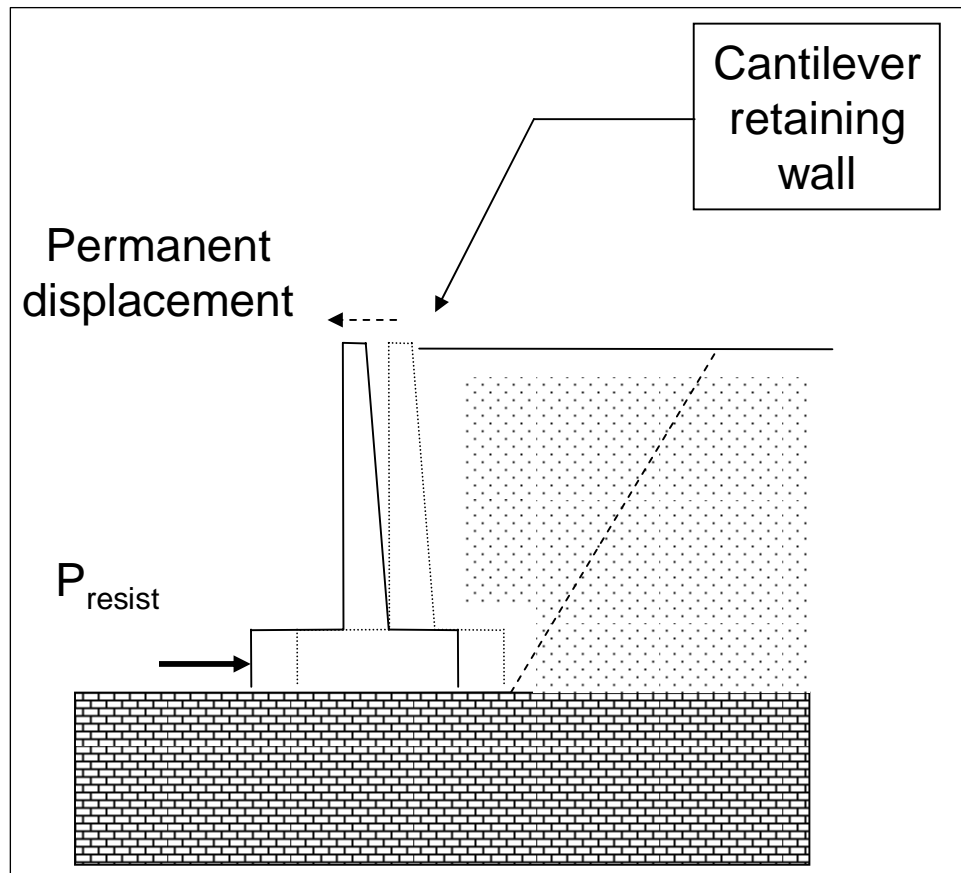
Permanent, seismically induced displacement of a rock-founded cantilever wall retaining moist backfill and with toe restraint, computed using CorpsWallSlip.
